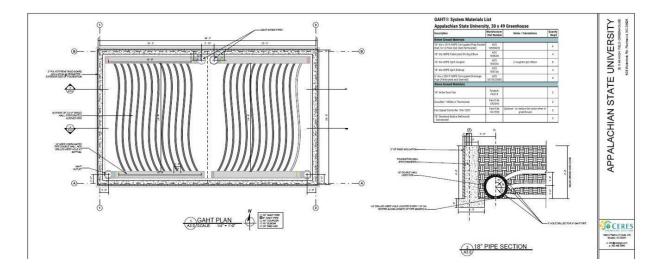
Ceres Greenhouse Construction Detail with GAHT below
